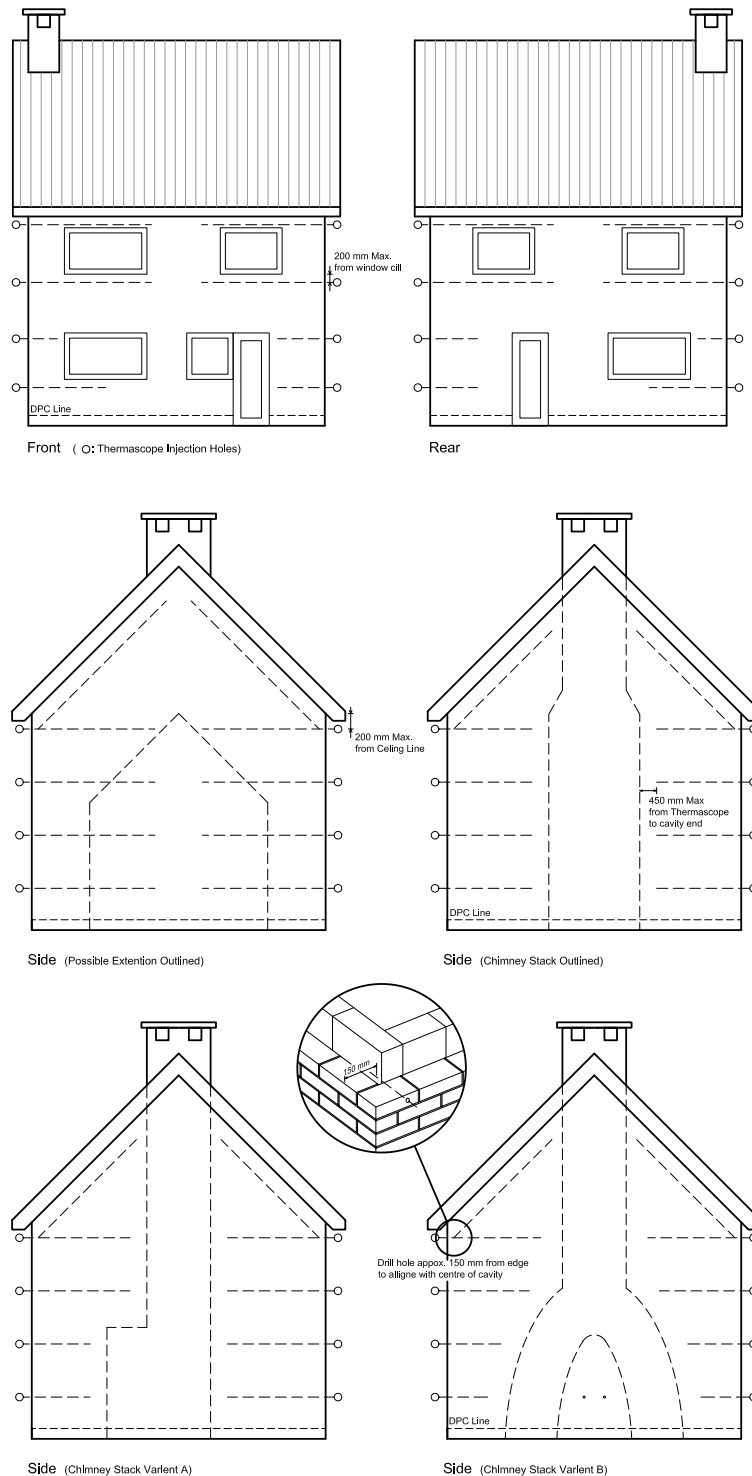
Typical Warmfill hole drilling pattern in a Detached Dwelling for Residual Fill Application - New and existing buildings with existing partial fill insulation in cavity
